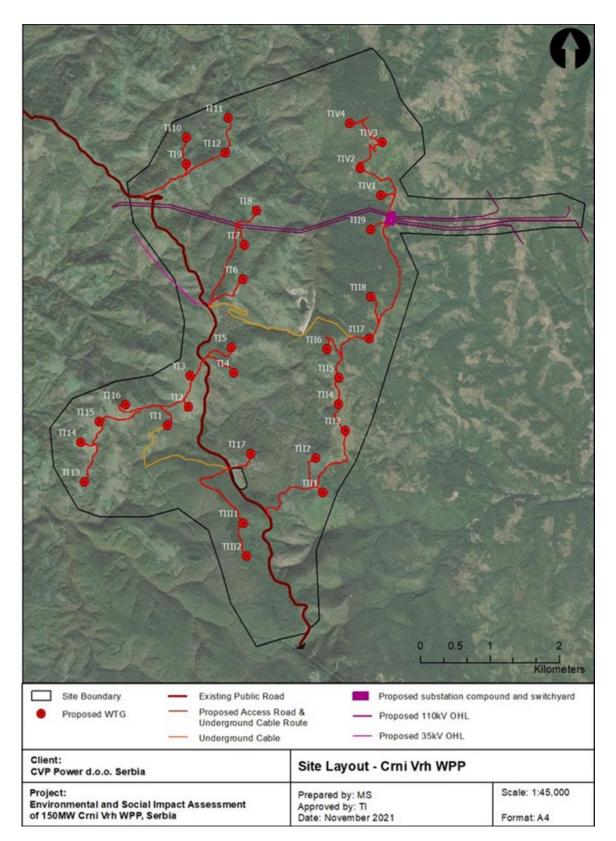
Conceptual Location of the WTGs, Site Access Tracks, and Sub-station
